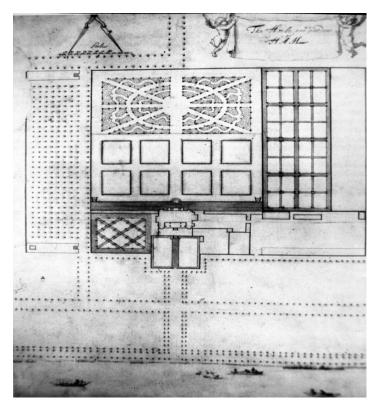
Plan of Ham House and Garden*, drawn by John Slezer and Jan Wyck, c.1671-2, Ham House, Petersham, Surrey.
